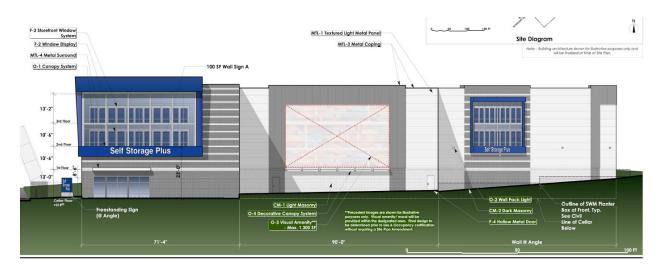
Architectural Elevation (view from Parklawn Drive looking west)
